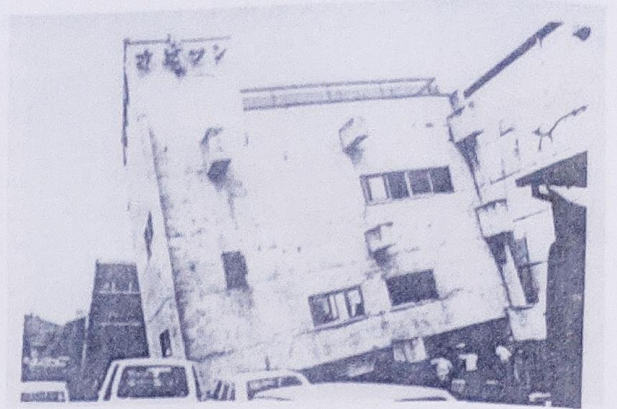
Obisan Building Oroshicho area, Sendai: view from the northwest. This is a 3-storey reinforced concrete frame building with a soft first story, one span in each direction. The columns were inadequate to resist the torsional force caused by a heavy eccentric stairwell that cantilevered over the column line at the right end of the building.
